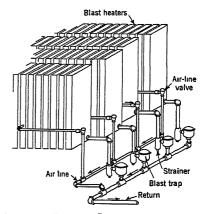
Typical Connections to Central Fan System Heating Units Exceeding 12 Sections
